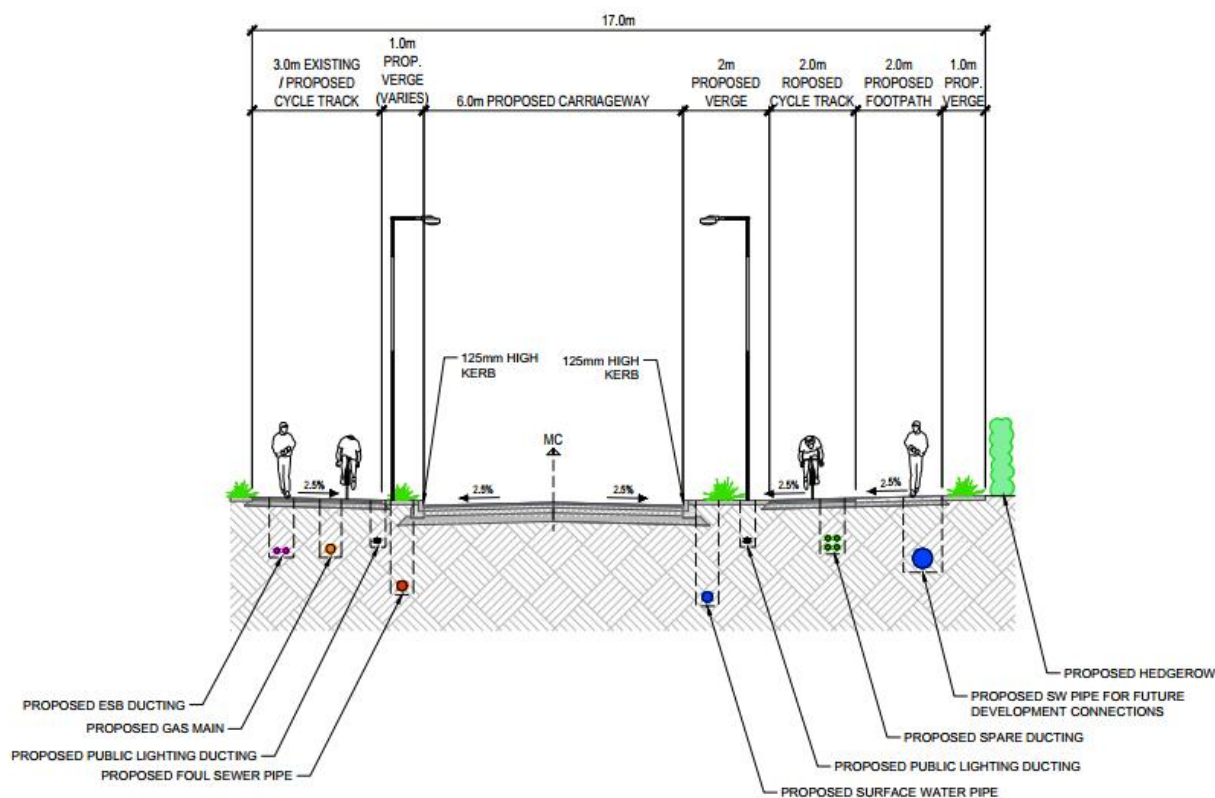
Typical Cross-Section of Wisnes Road upgrade
